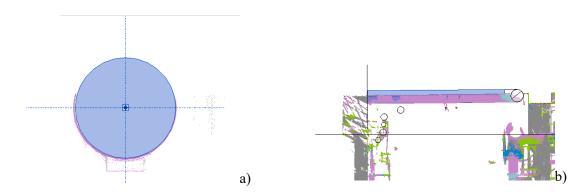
A single pipe segment with two different view a) Section view b) Floor plan view
